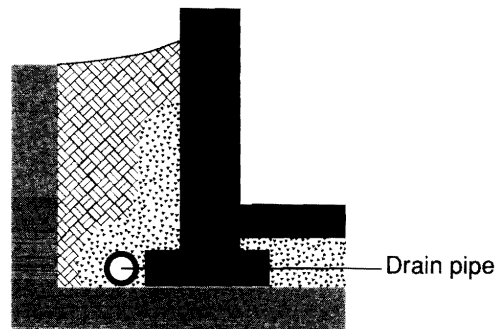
Drainage at base of foundation wall using conventional drainage pipe
